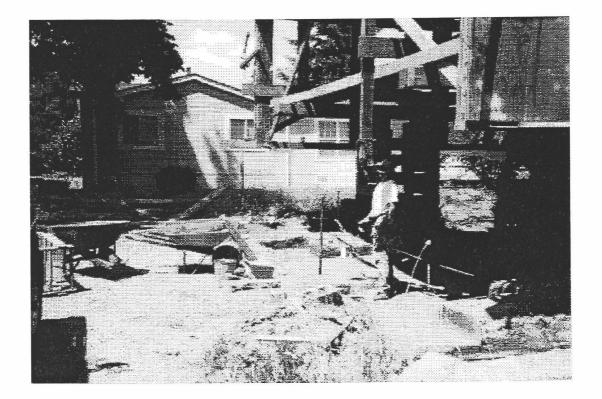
Foundation Trench Excavation (Research photo on file at Oregon State University)
